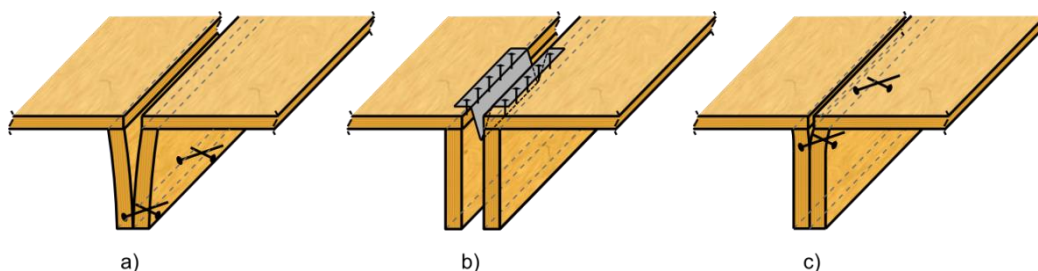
Details for a concentrated floor gap a) lower joist connection, b) connection with thin steel plate, c) upper joist connection
